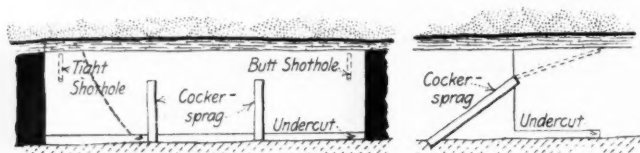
DRILL HOLES AND COCKERSPRAGS IN FACE
